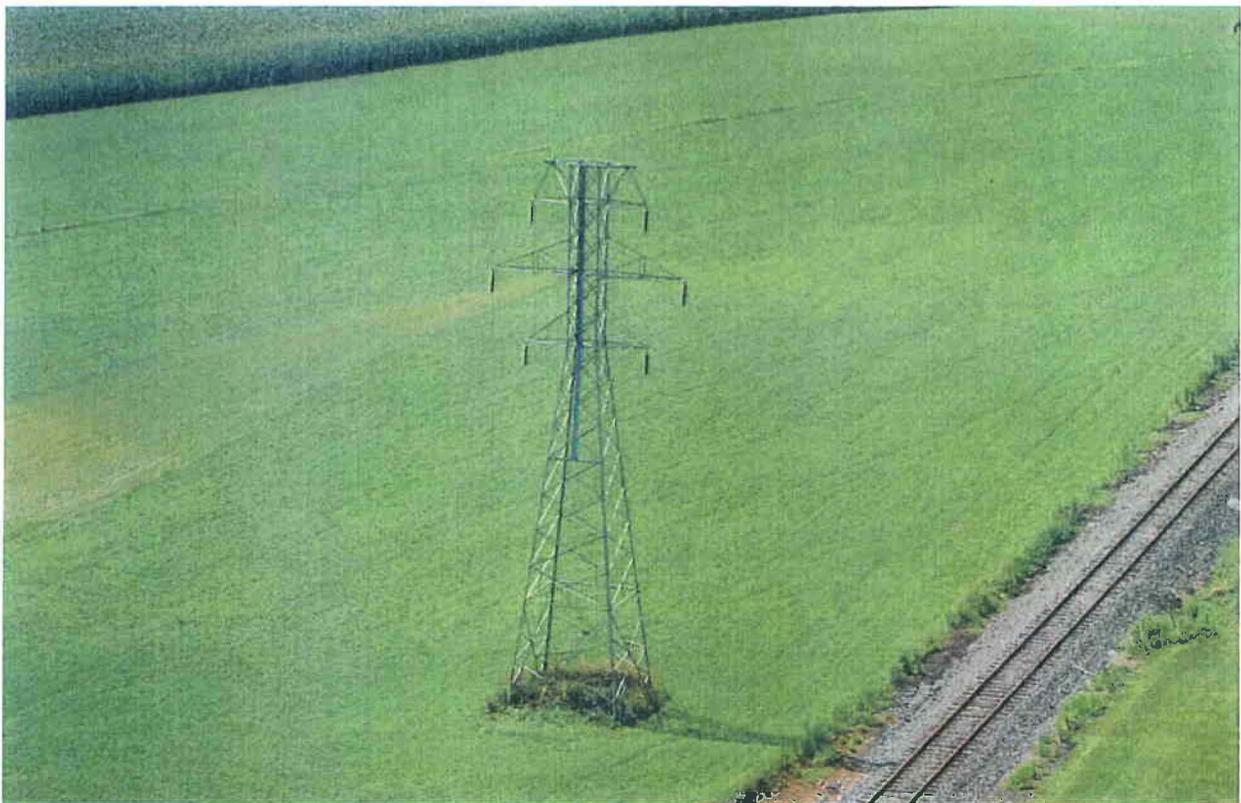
TYPICAL EXISTING LATTICE TOWER TO BE REPLACED OR REINSULATED
